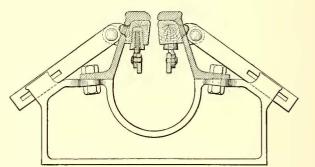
YOKE TO BE USED WITH CONCRETE CONDUIT.
